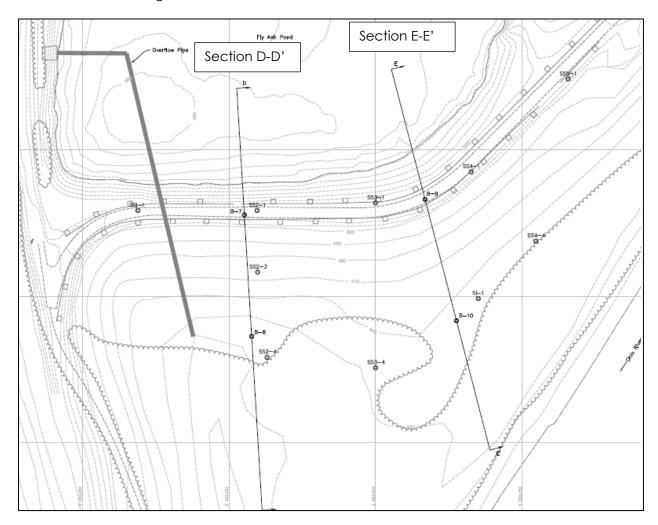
Clifty Creek LRCP Dam - Plan View of Cross Sections
